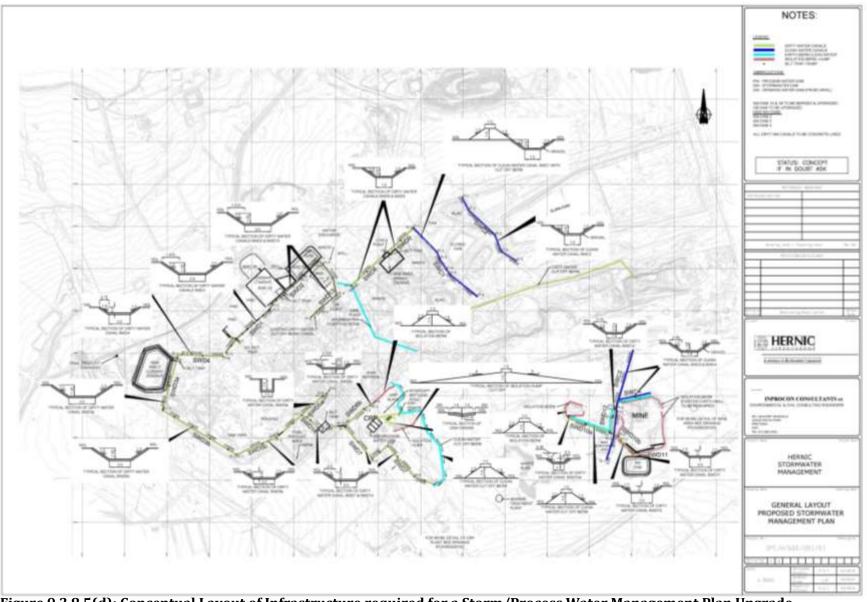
(d): Conceptual Layout of Infrastructure required for a Storm/Process Water Management Plan Upgrade
